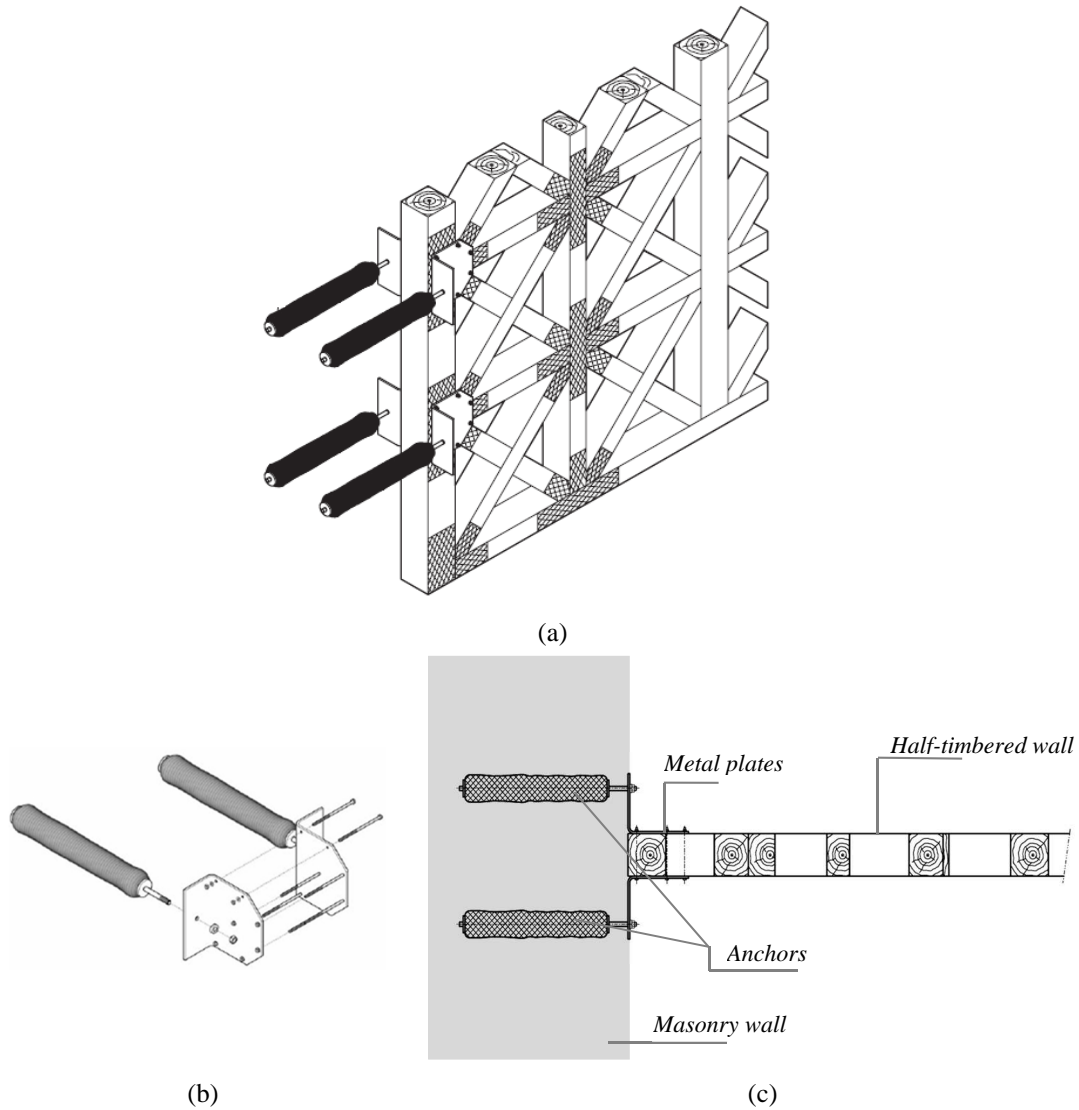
Strengthening solution with parallel anchors: (a) 3D view of the timber frame wall and the connecting anchoring system; (b) Connecting system; (c) Top view strengthening system (adapted from (Cóias 2007)).
